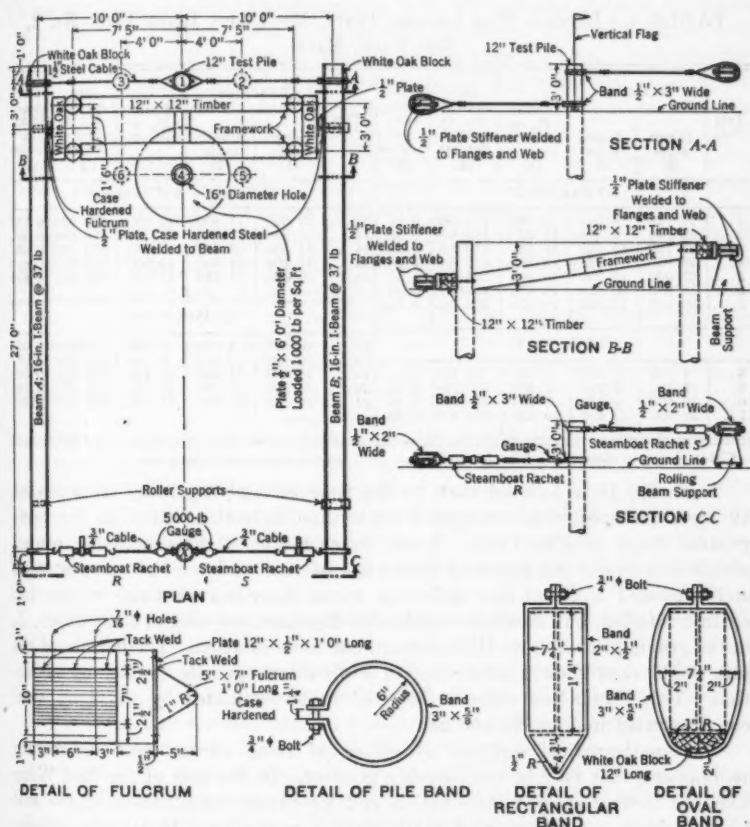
ARRANGEMENT FOR PILE TESTS.
